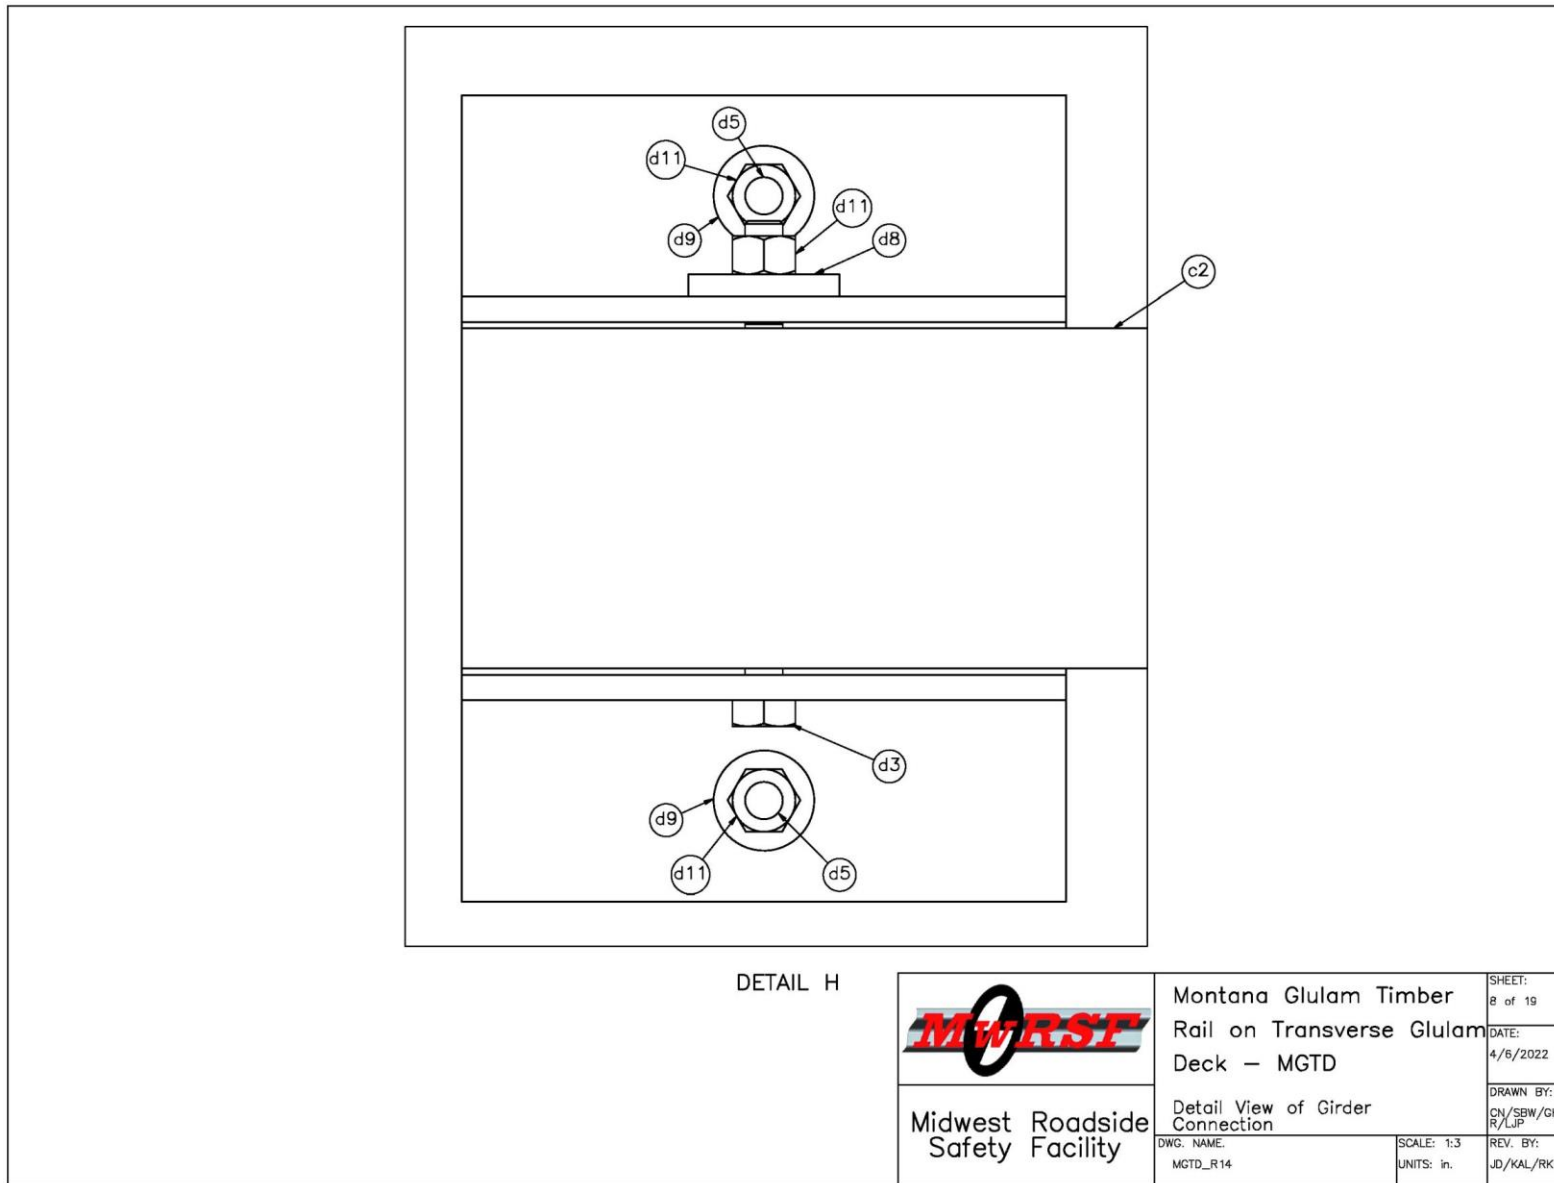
Detail View of Girder Connection, Test Nos. MGTD-1S and MGTD-1D
